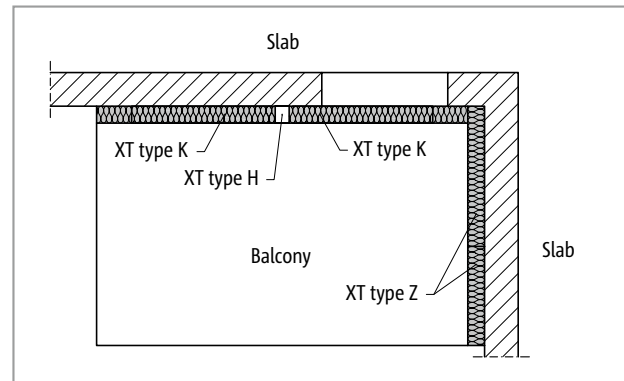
Schöck Isokorb® XT type H: Balcony freely cantilevered
